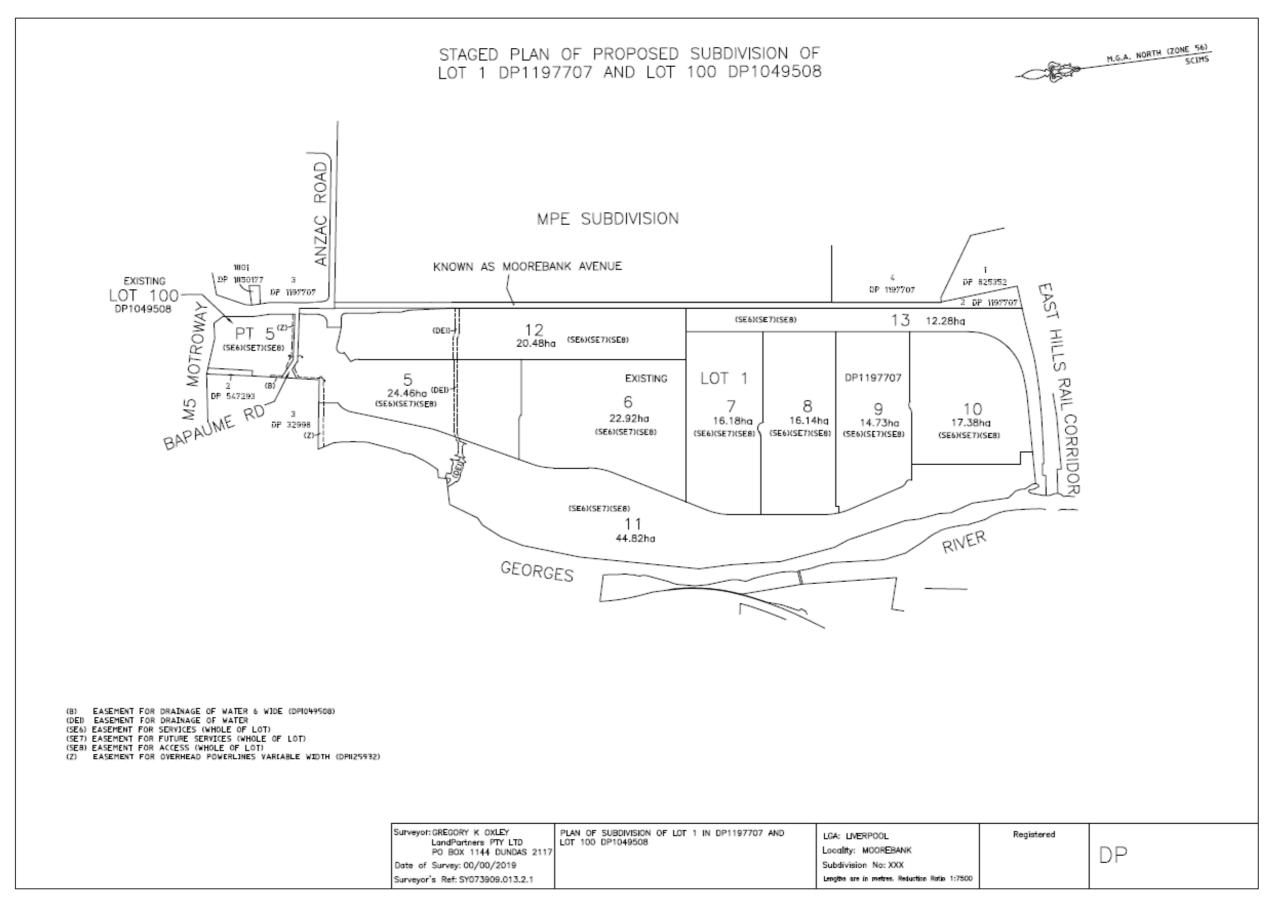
| Proposed draft plan of subdivision of existing lot 1 in DP 1197707 - Sheet 01 of 03 (Source: Applicant's RtS)
